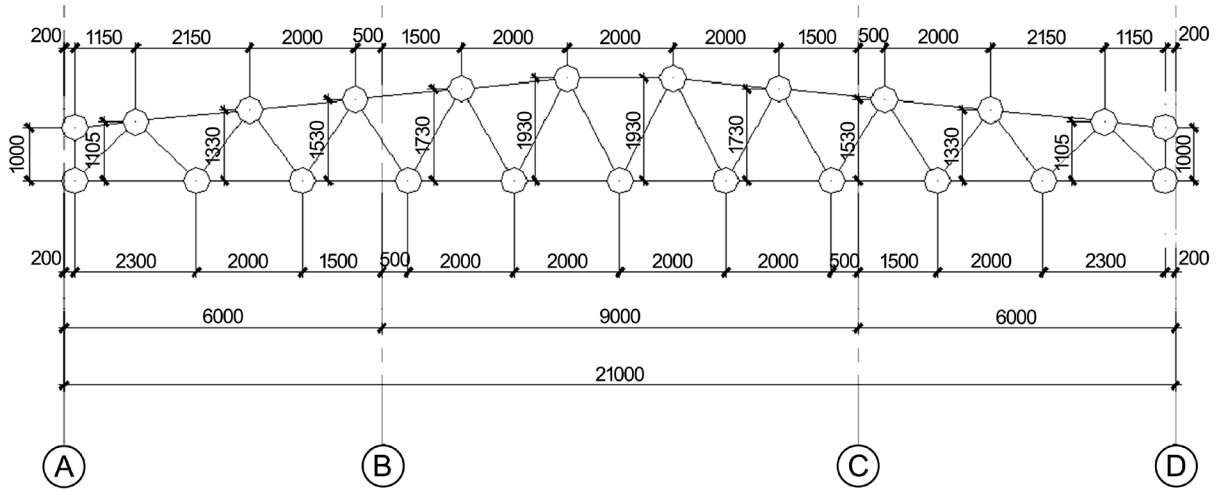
Side view of welded hollow spherical joint flat grid structure
